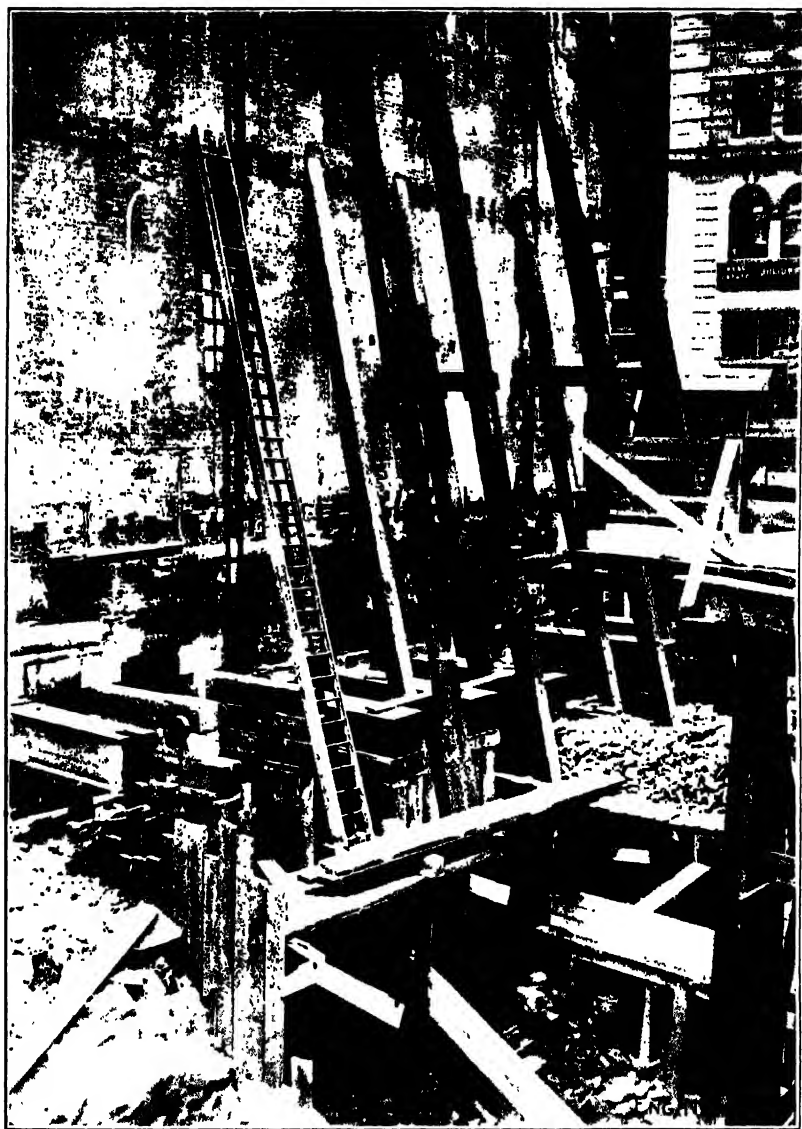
Use of Long Shores in Underpinning Cross Building, New York.
